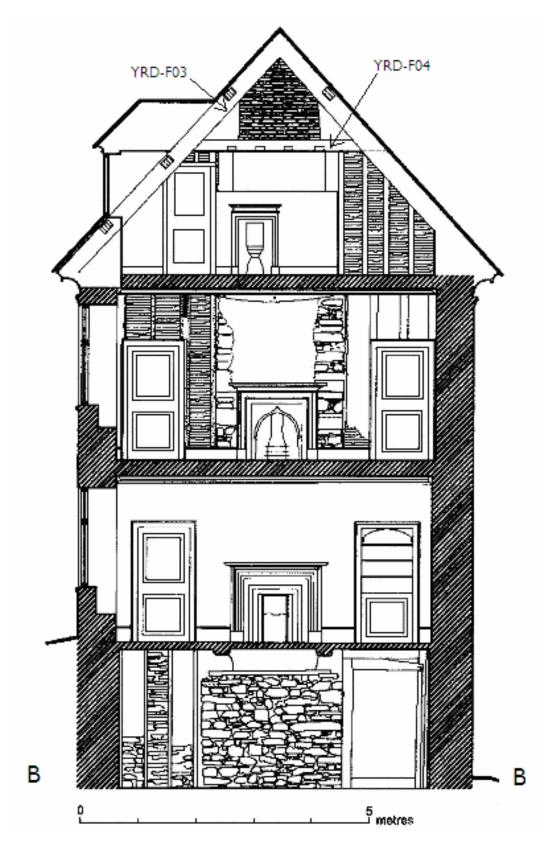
South range; east facing section B–B, showing the location of samples YRD-F03 and YRD-F04 (John Allan, location of section marked on Fig 8)
